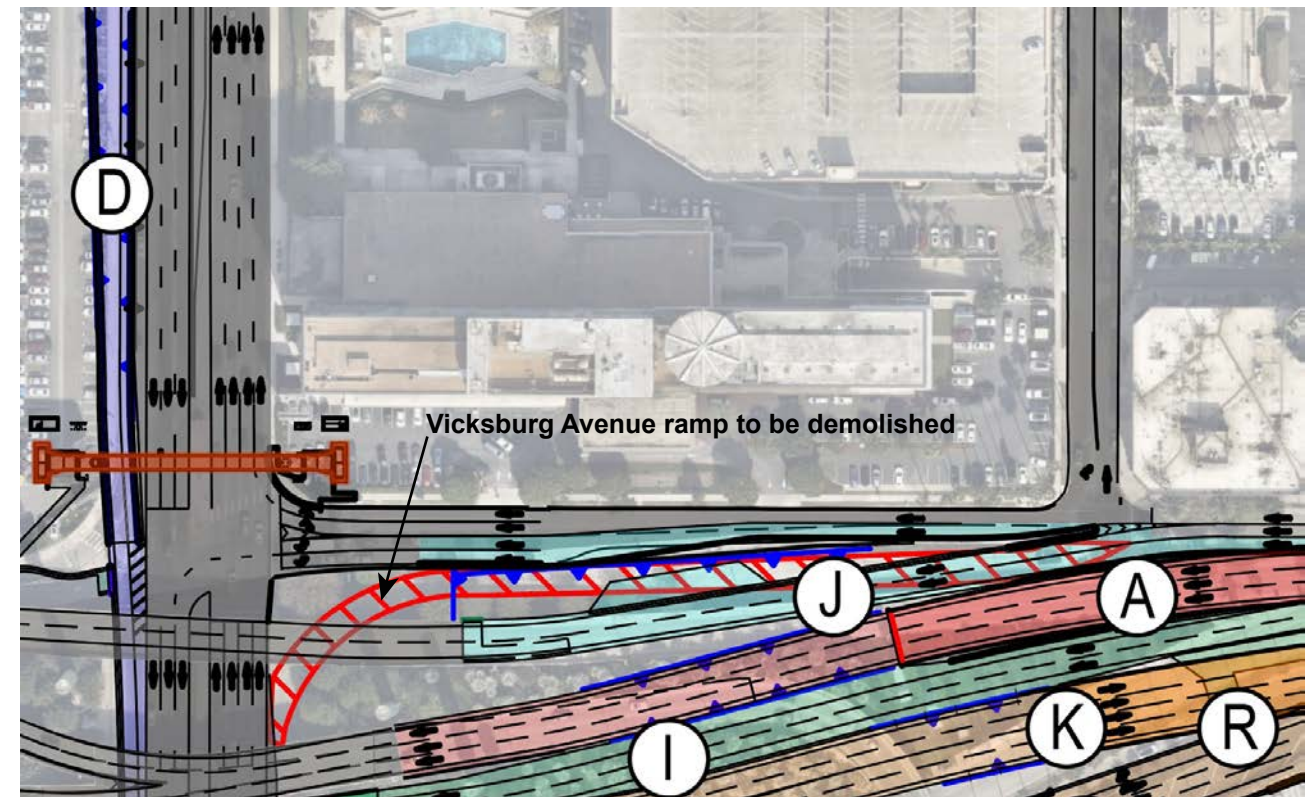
Vicksburg Avenue from Sepulveda Boulevard northbound would be demolished.
